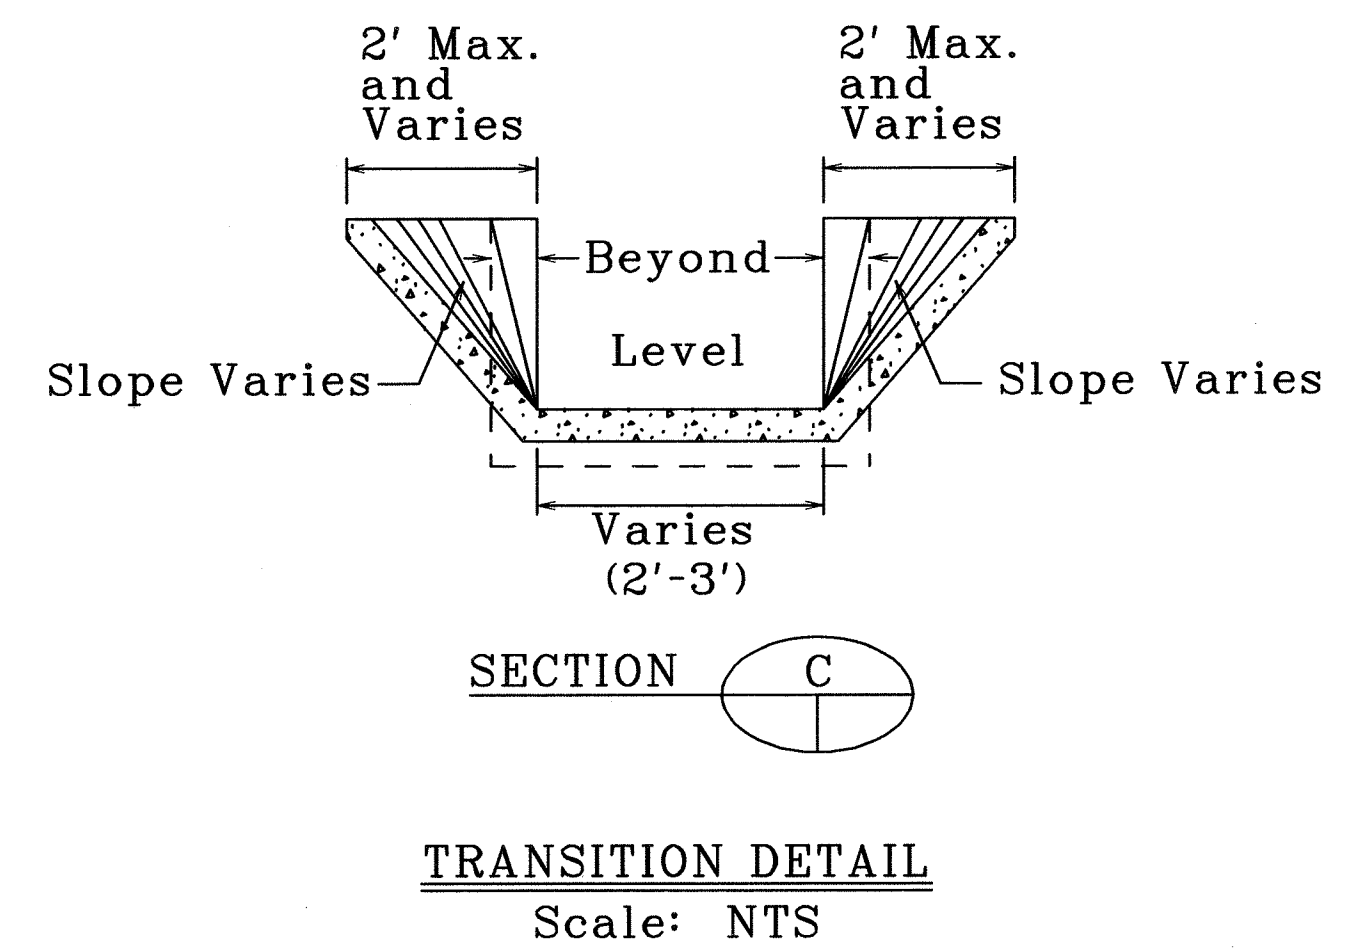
TYPICAL LINED TRAP DITCH
